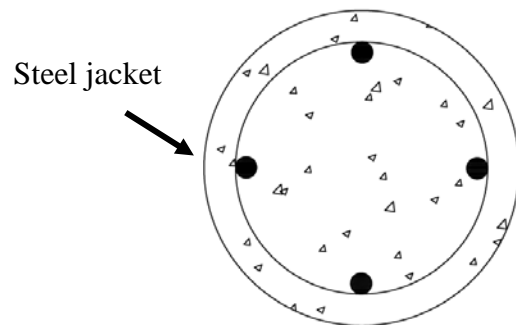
Standard steel jacket on circular reinforced concrete columns
